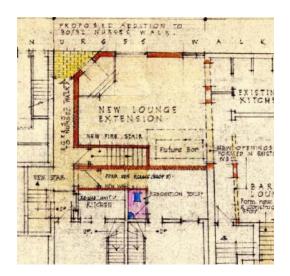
Rear of 139–141 George Street, Ground Floor c.1985 (detail). The demolition of the sections of the wall between 139–141 George Street (New Lounge Extension) and 137 George Street was not completed at this stage and it appears that the proposed lounge was instead fitted out as a commercial space.22 The plans of the rear sections of the two shops facing George Street (see Figure X) were altered to accommodate the new fire stair. Source: PMNSW – ROX 410 AR 0001/DR.
